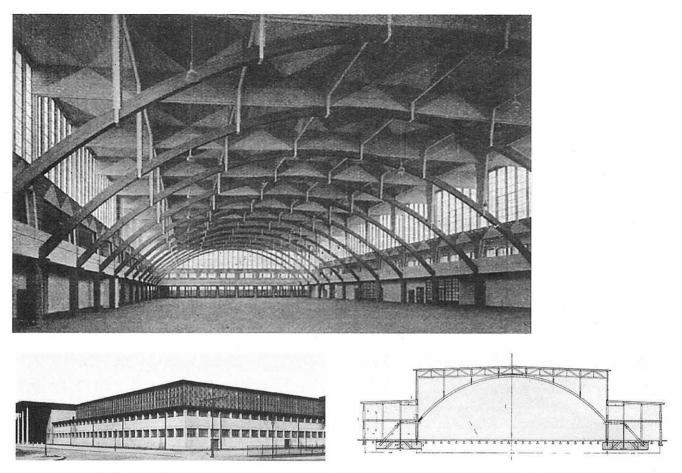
Messehof in Breslau, 1924. Design by Max Berg. Solid-web girders construction manufactured by the firm Tuchscherer Inc.. Parabolic two-hinged arches with a span of 37.60 m.
